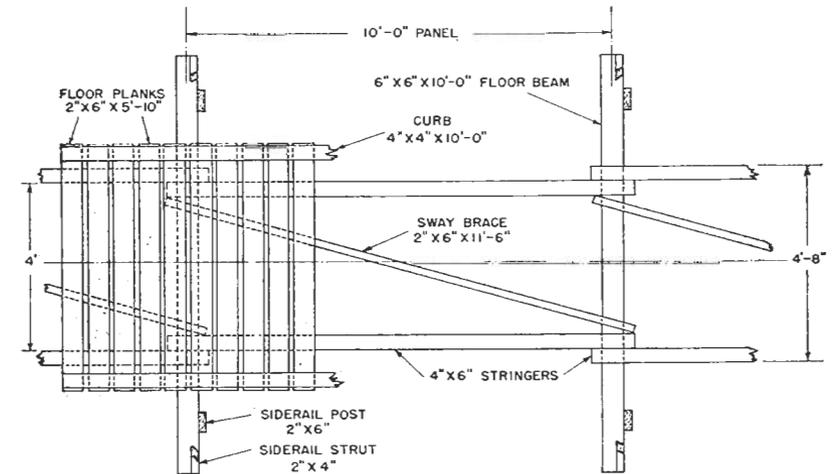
Timber sway bracing of light-equipment suspension bridge.
